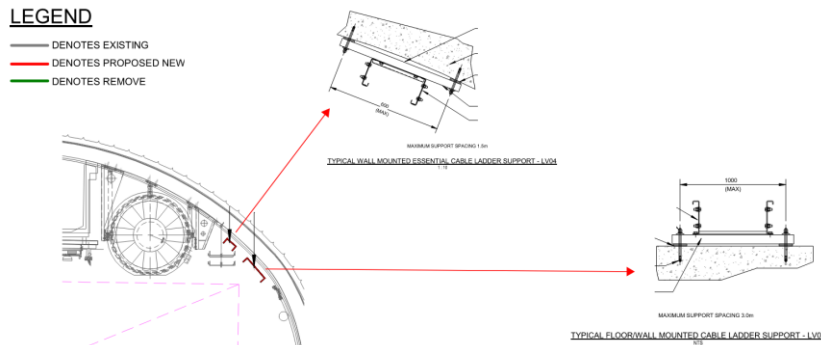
Cable route design near jet fans – Wall mounted arrangement.
